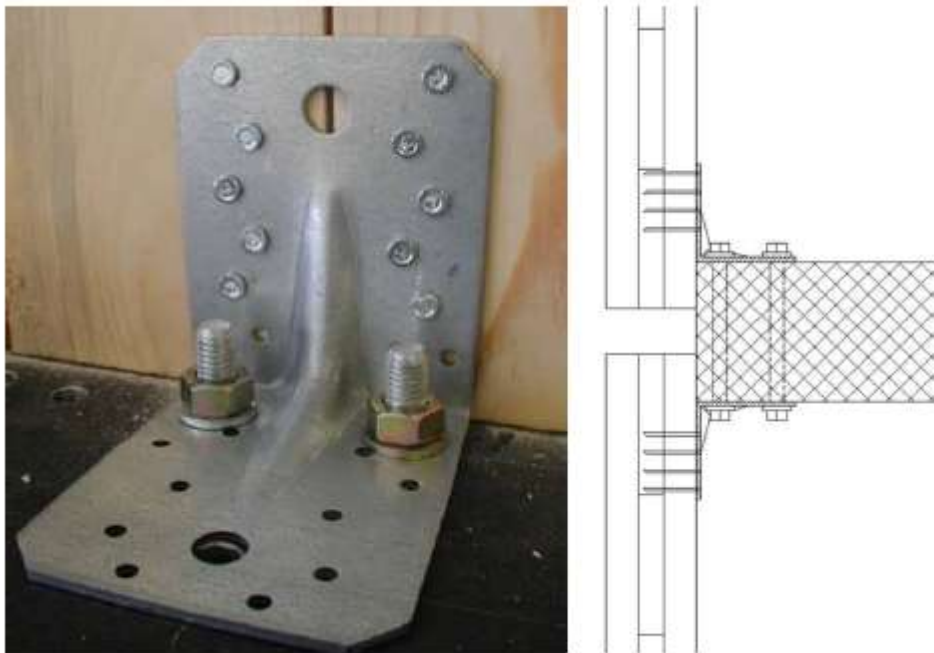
connection type in concrete frame with in-fill timber wall system.
